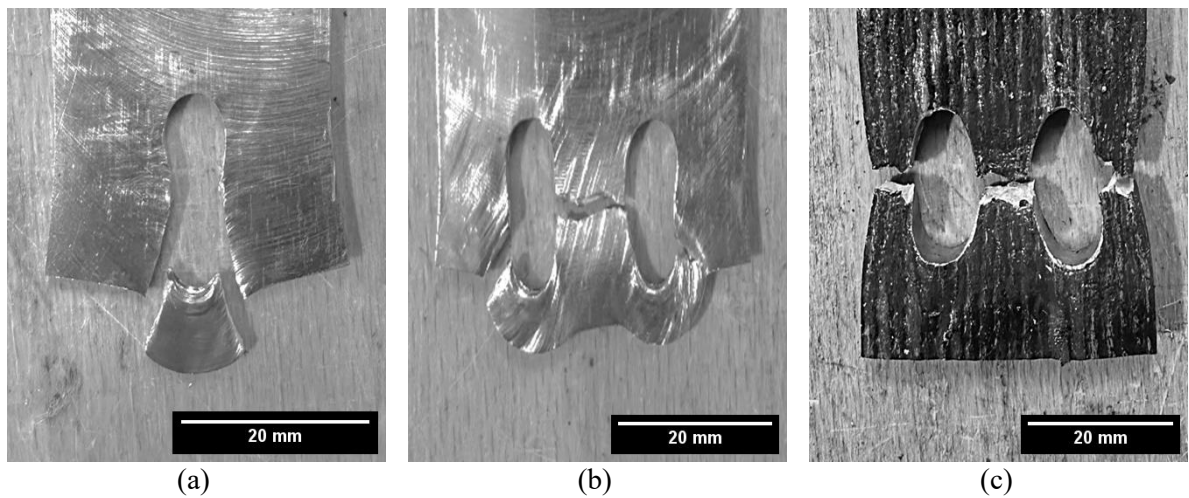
Representative governing failure modes observed in double-bolted configuration plates: (a) and (b) correspond to WAAM machined plates exhibiting SO and BT failures, respectively; (c) shows a WAAM as-built plate with NST failure [41].
